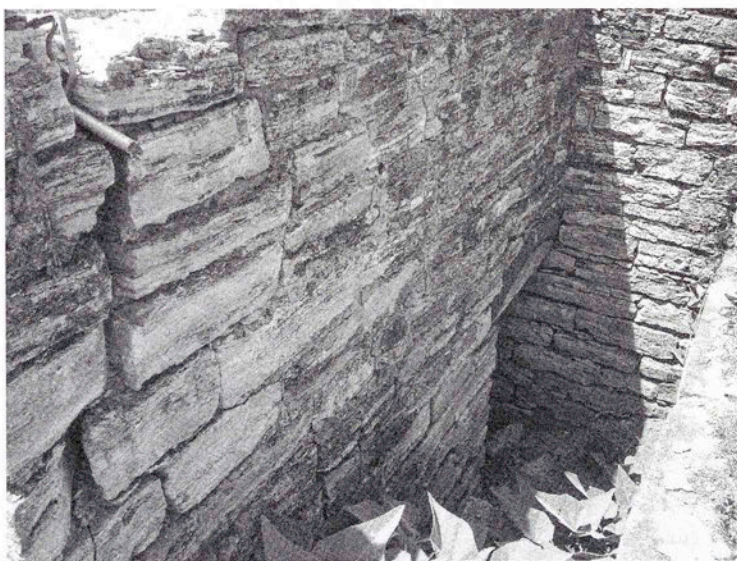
Quarried Dolomite stone used to build the foundation of the barn and outer walls of the root cellar. (Photo by Lynda Ramsey)
